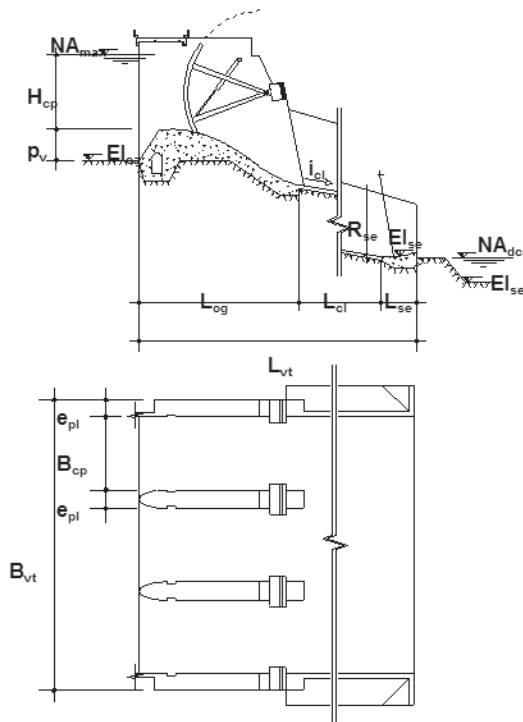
Typical cross-section of a gated surface abutment spillway with a ski jump.
